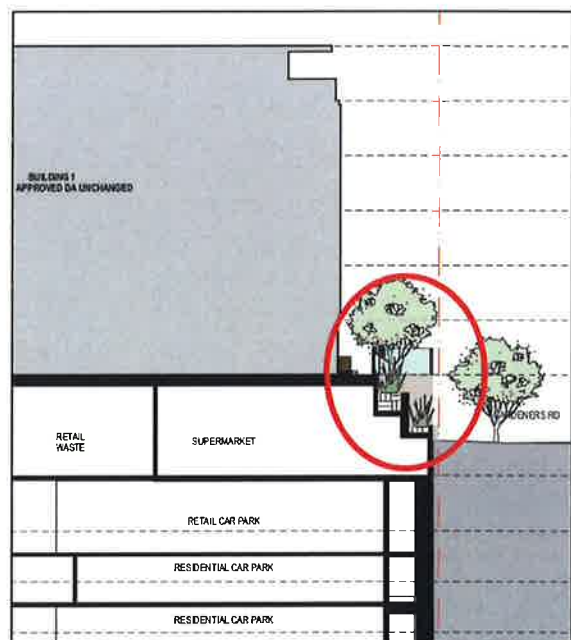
Proposed Section at Gardeners (source: Proponent's RTS)
